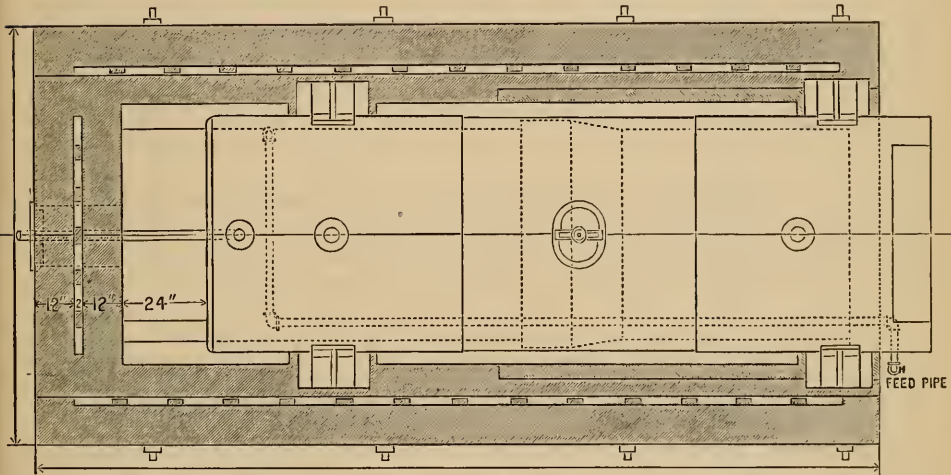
HORIZONTAL SECTION OF WALLS AT CENTER OF BOILER.
